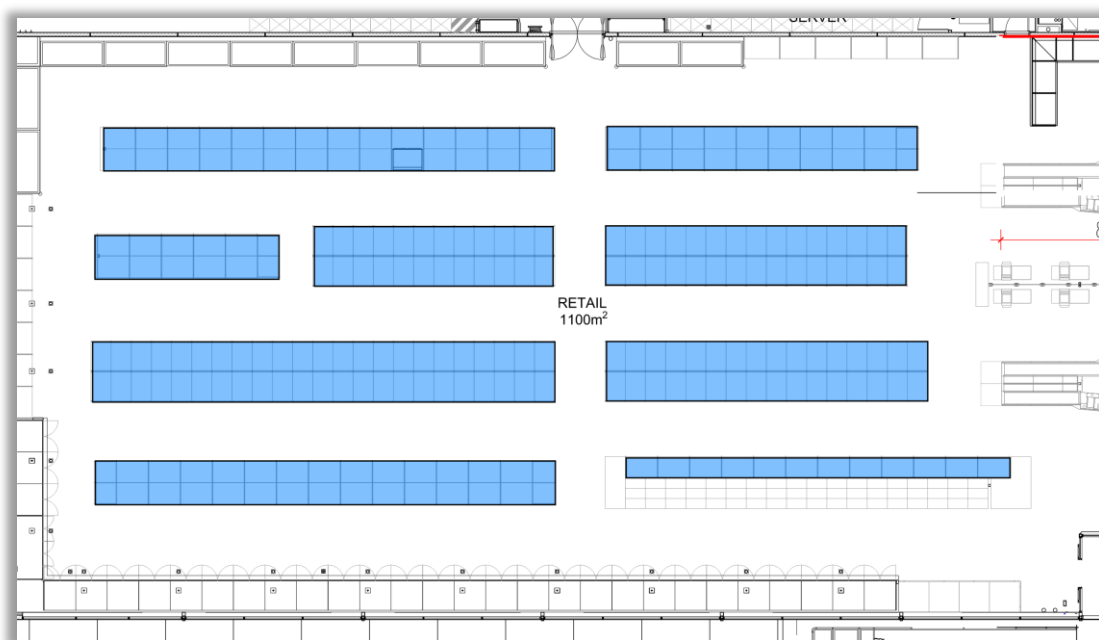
Proposed 99 kW Rooftop Solar PV - ALDI
